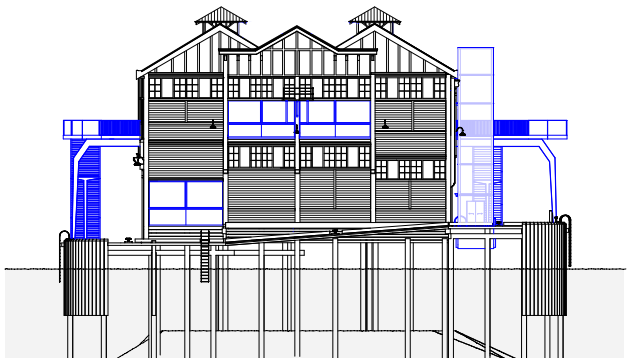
Proposed north elevation Pier 2/3, (alterations shown in blue).
